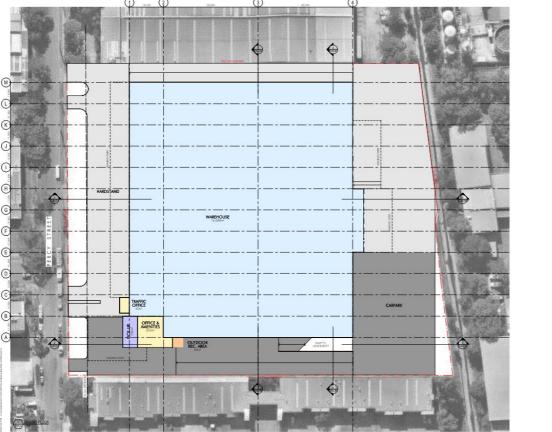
Conceptual Site Plan (Source: Nettleton Tribe, May 2020)
